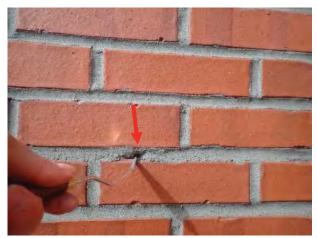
View of scaffolding tie-back, carelessly left embedded in mortar joint, and causing mortar spalling as the steel corrodes.
